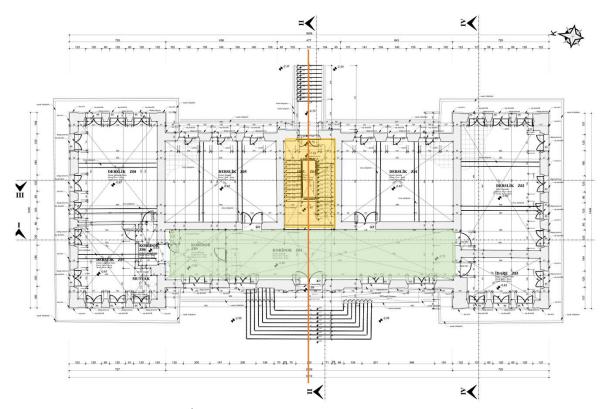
İsmet Paşa Primary School ground floor plan [18].
